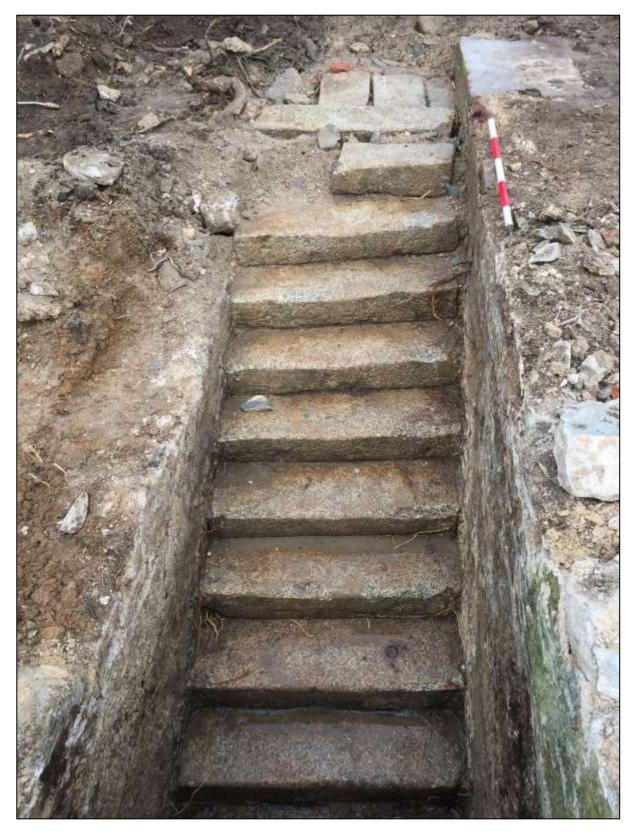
Staircase and stairwell to the service tunnels. Looking N
